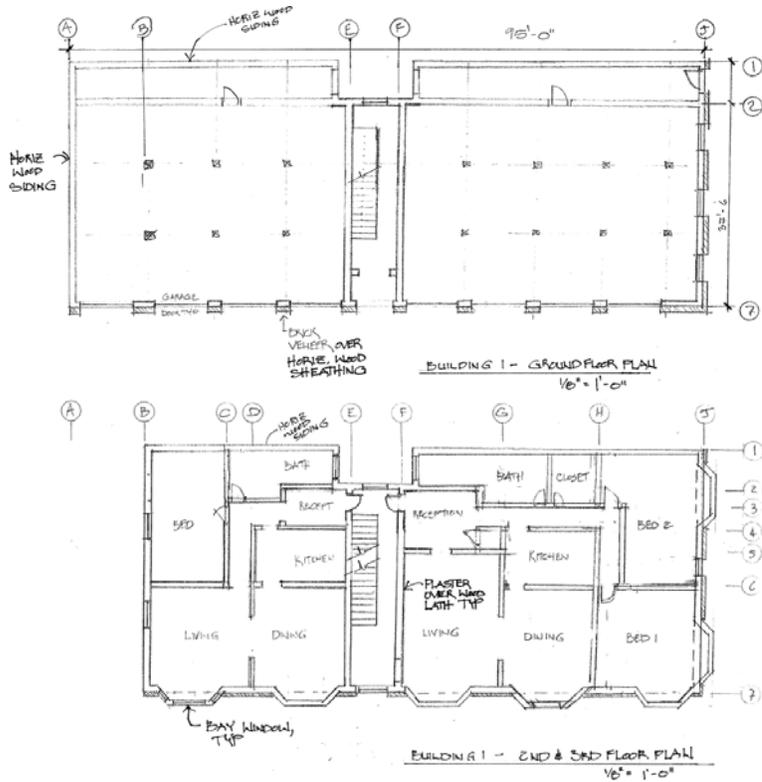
Index Building 1 ground story and upper story plans prior to seismic retrofit.
